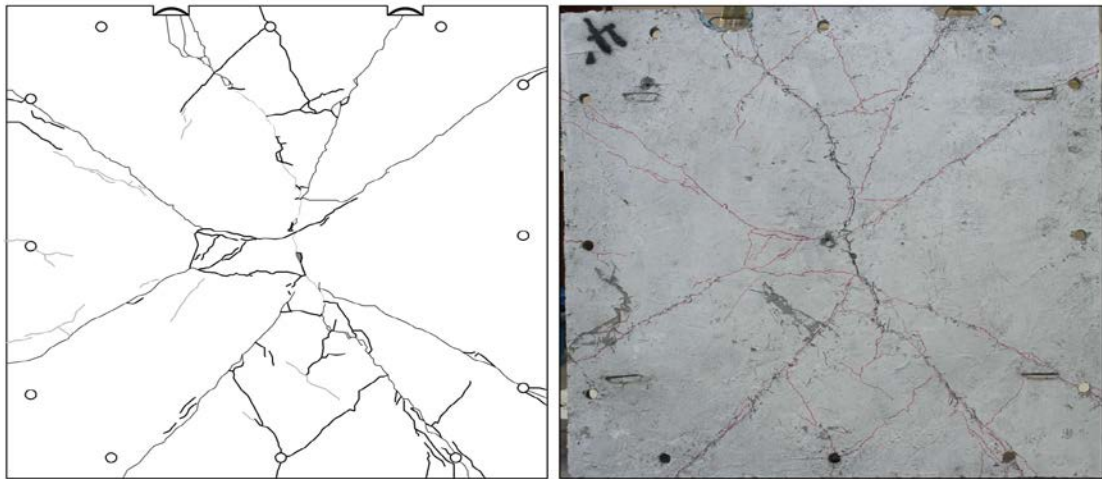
Front Face Crack Patterns After Testing for Panel JA2-125+PVA
